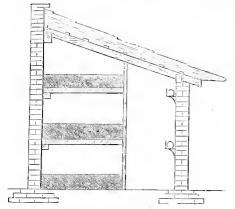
SECTION OF LEAN-TO MUSHROOM HOUSE.
